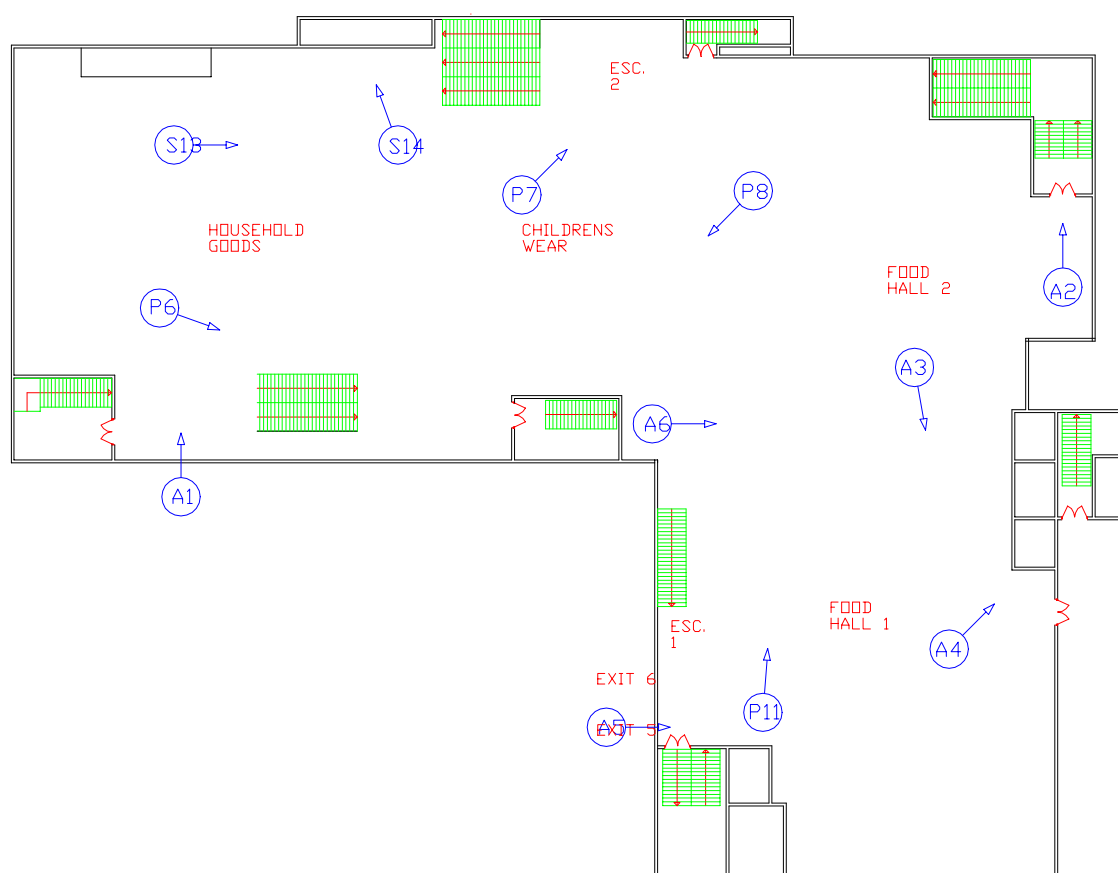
The plan and camera position of the ground floor at Marks & Spencer, Belfast
